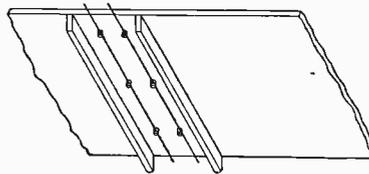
Conductors Protected by Wooden Guard-Strips on Low Ceiling.
